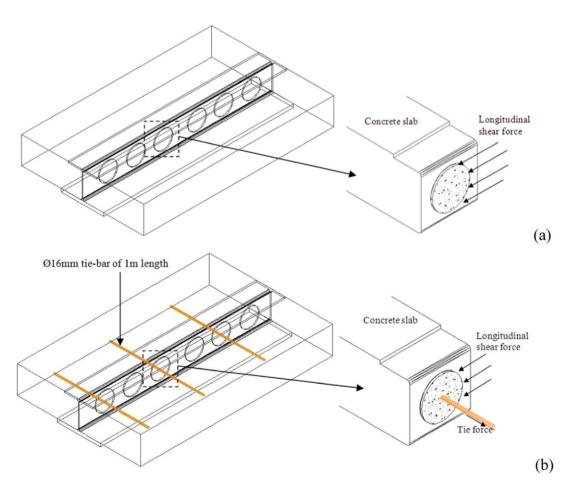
Shear transferring mechanisms of (a) concrete-infill-only shear connection (b) tie-bar shear connection [2].
